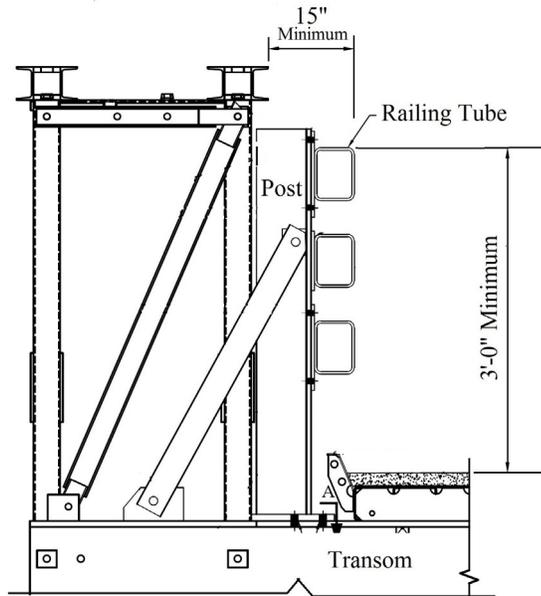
Vehicular Railing Offset Requirement for Railing Height of 3 feet
